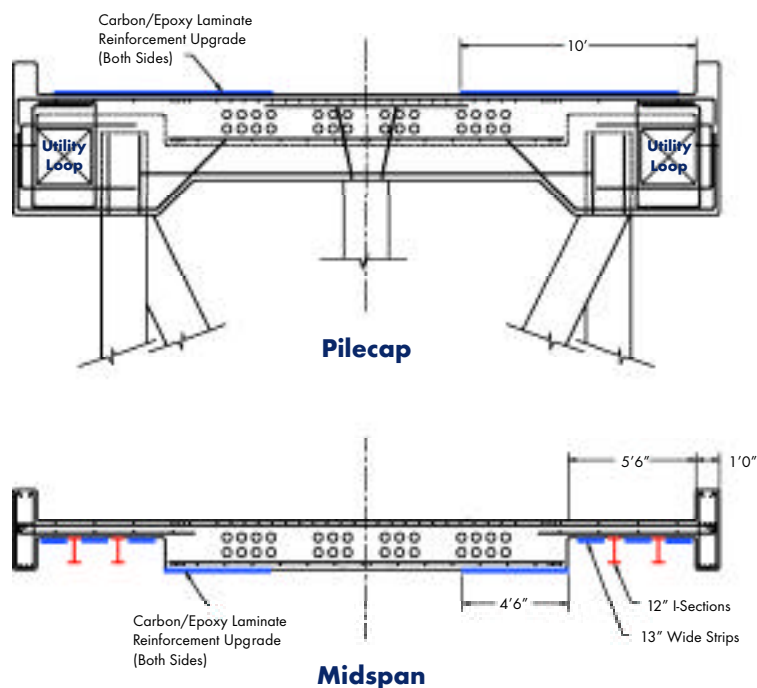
Cross Sections of the Reinforced San Diego Pier 12 at the Pilecap* and at Midspan Between Pilecaps.
